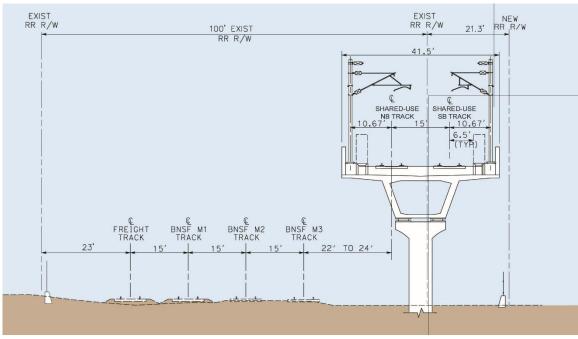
Cross Section from Slauson Avenue to Telegraph Road
